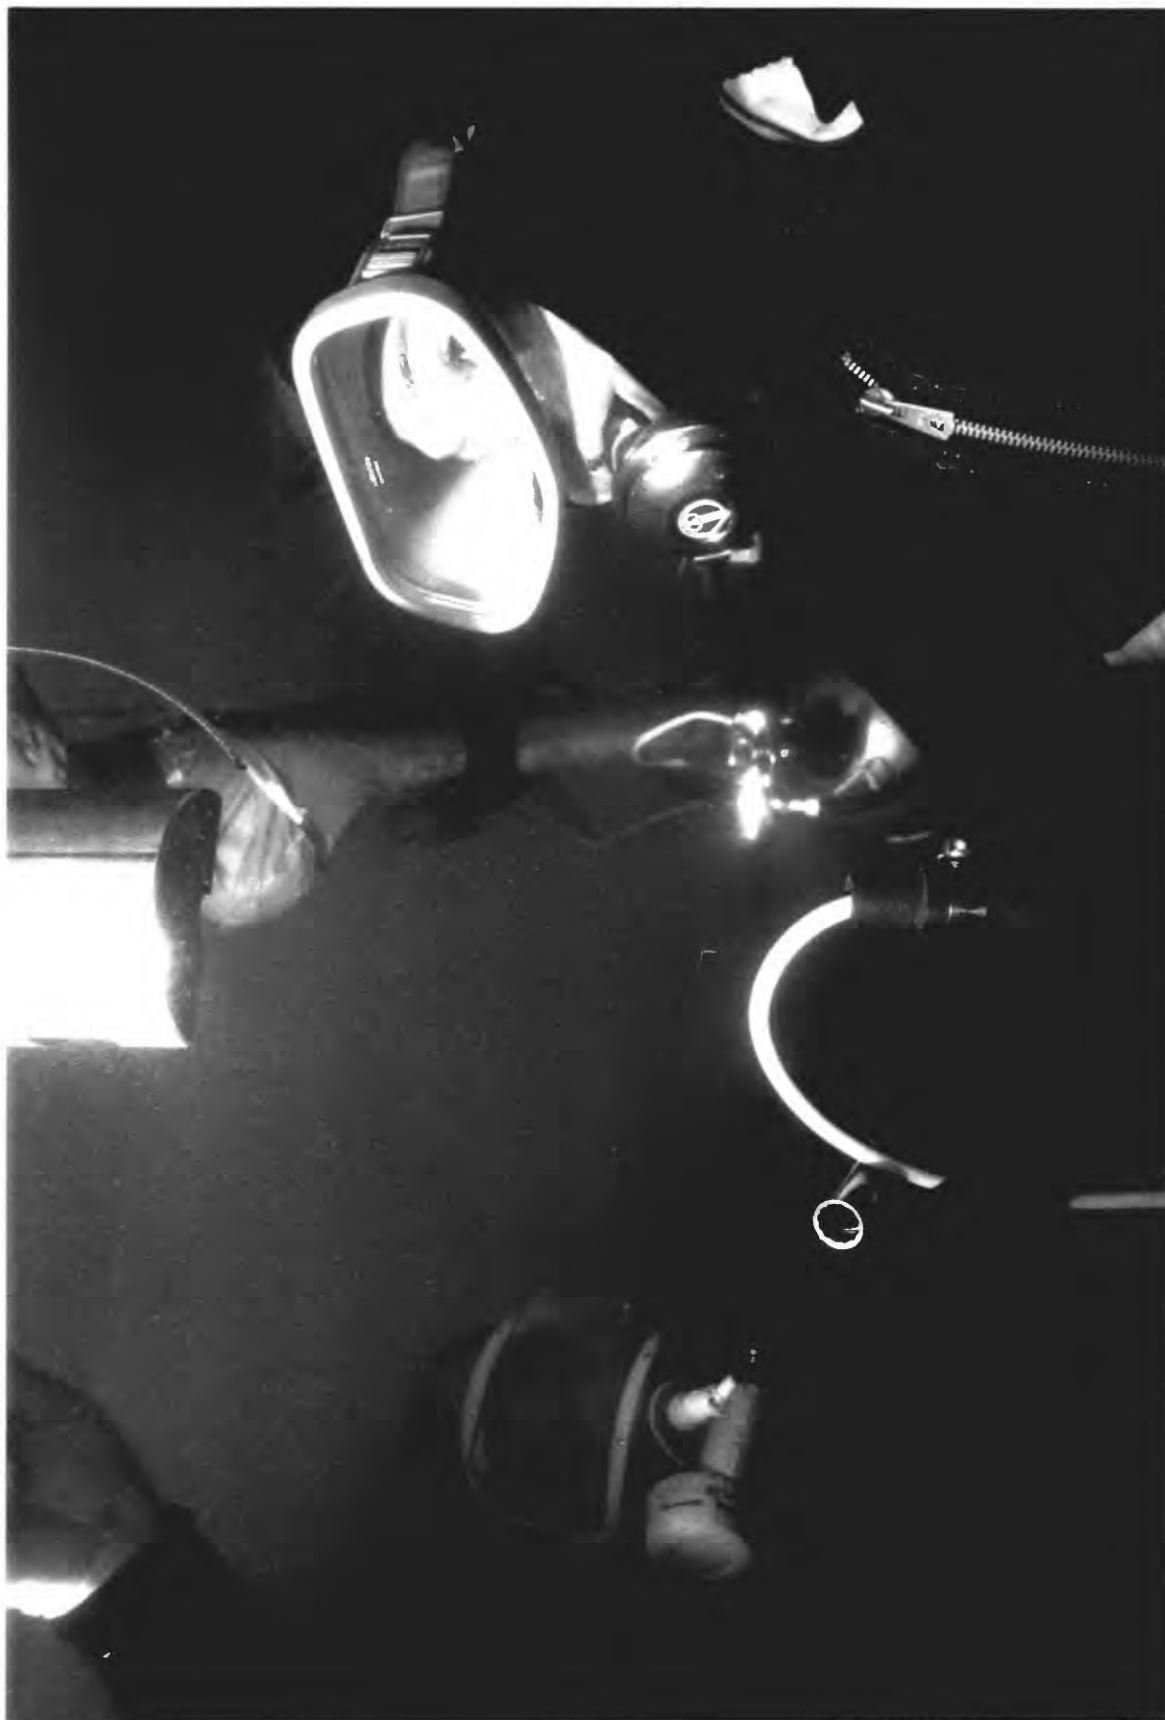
The ram-push rod connector is being attached to a push rod that will be used to extend the depth of cone penetration.
